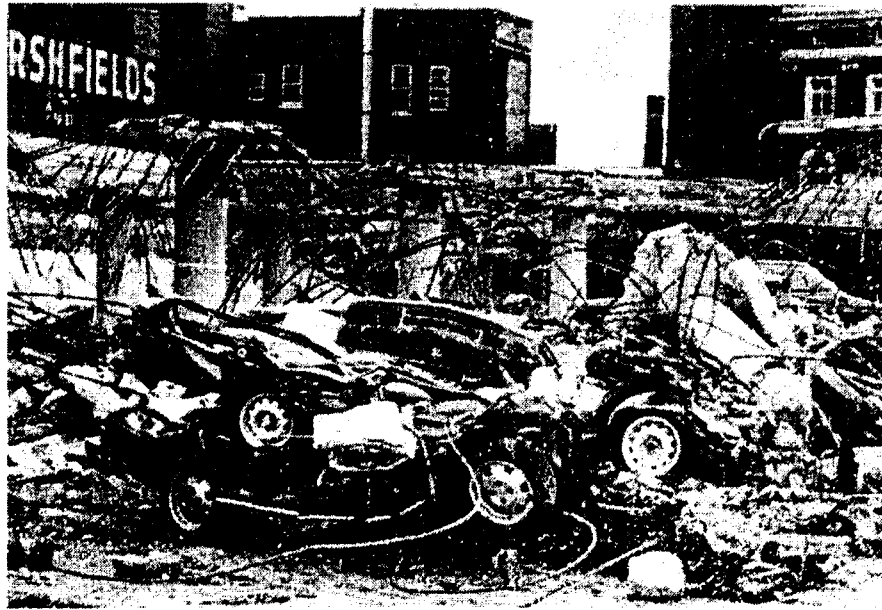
Collapse of a Salt-Damaged Parking Garage [Heidersbach, 1986]
